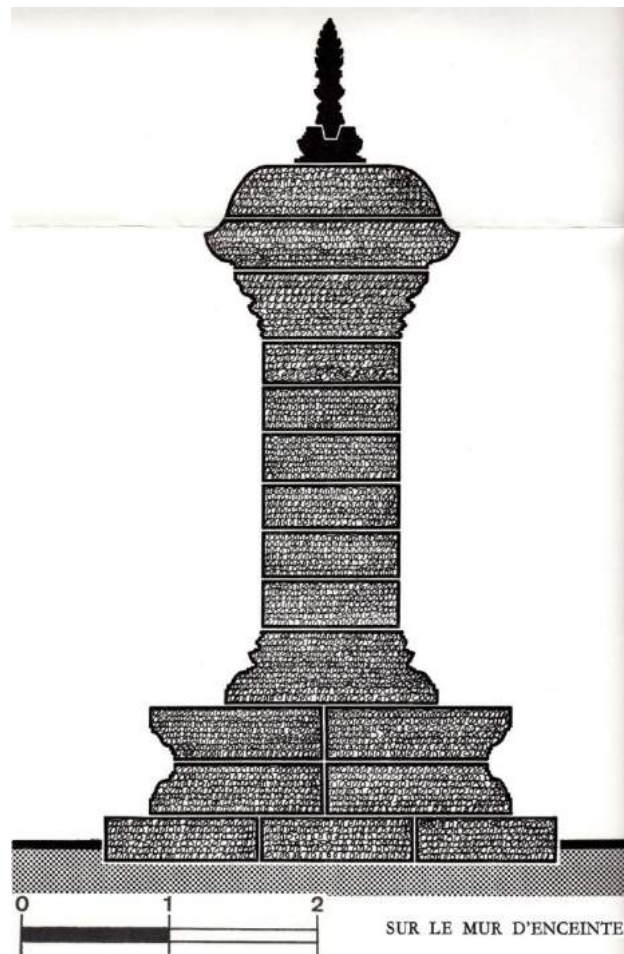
Enclosure wall cross section (after Nafilyan 1969, Plate LXXXIII)
